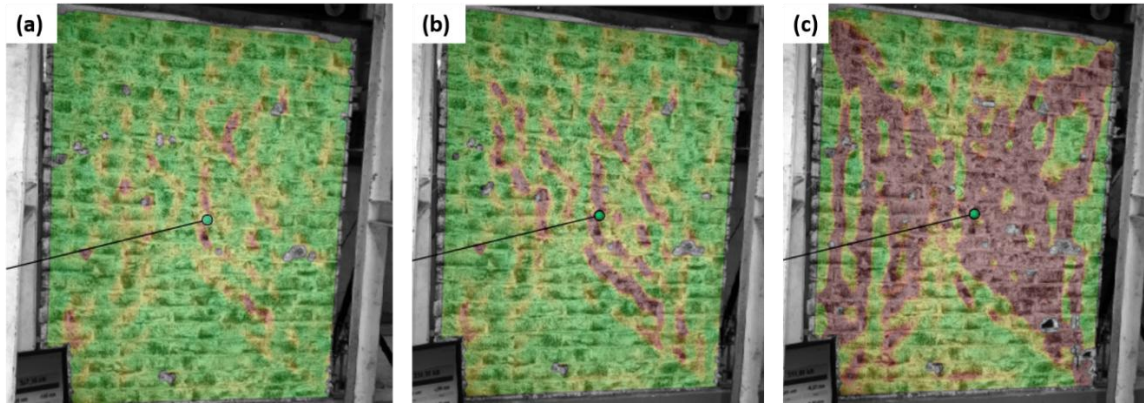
Initial crack formation (a), development of cracks at the center of the panel (b), and crack pattern one cycle prior to failure for masonry wall HC_116_A_30 (c).
